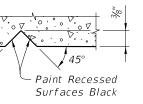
# DETAIL "A" - SECTION AT INTERMEDIATE OPEN JOINT
